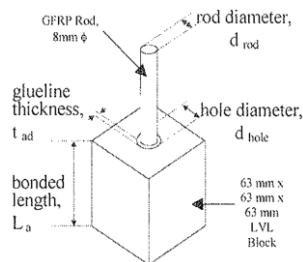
Single-ended pull-out test specimen (Mettem et al. 1999).
